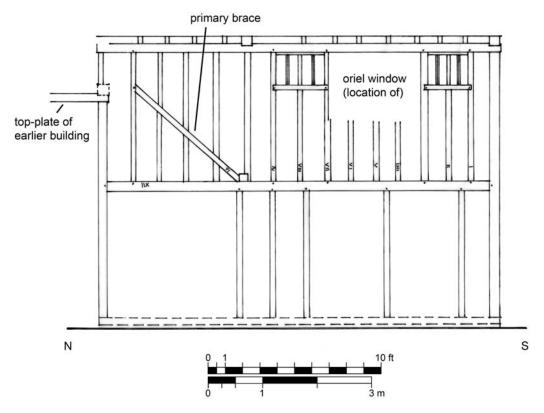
Front elevation of 54 Priory Street (corpus no. 80)
